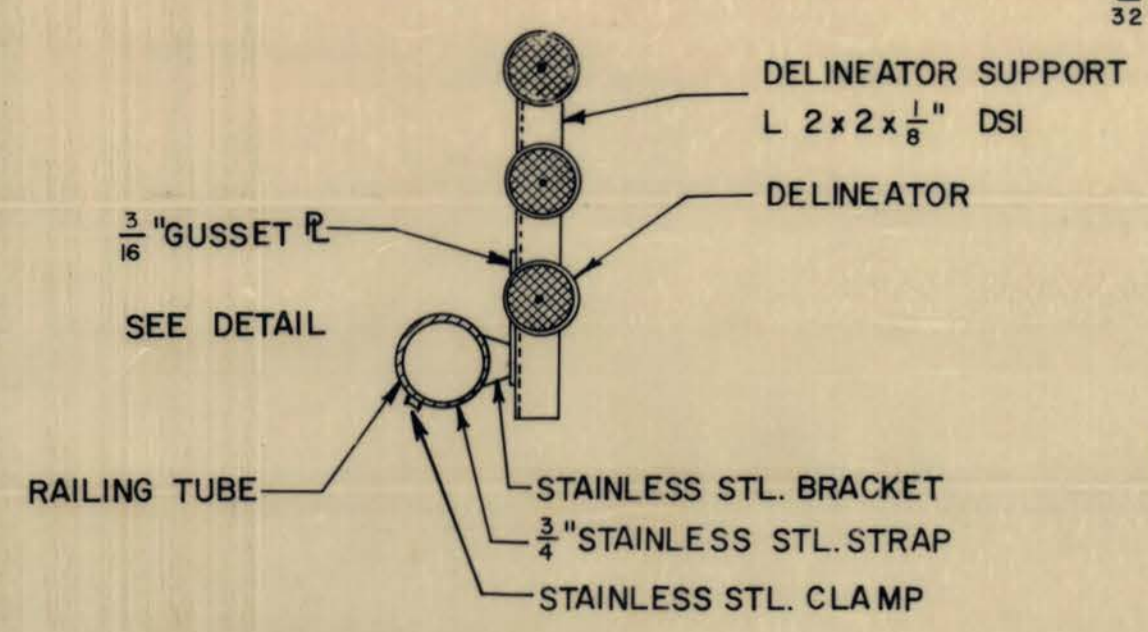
DETAIL SHOWING DELINEATOR ASSEMBLY ATTACHED TO RDWY. SIDE OF TUBE RAILING
